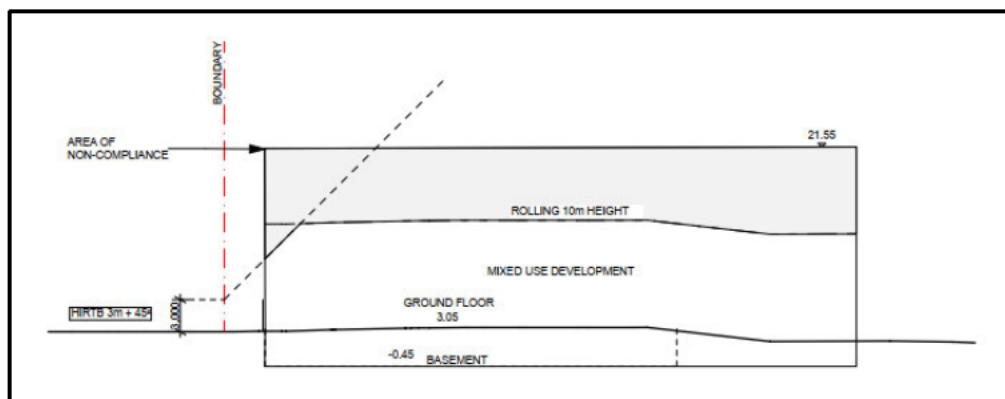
Section through mixed use building relative to the adjoining Open Space Environment (Source: Architects plans)
